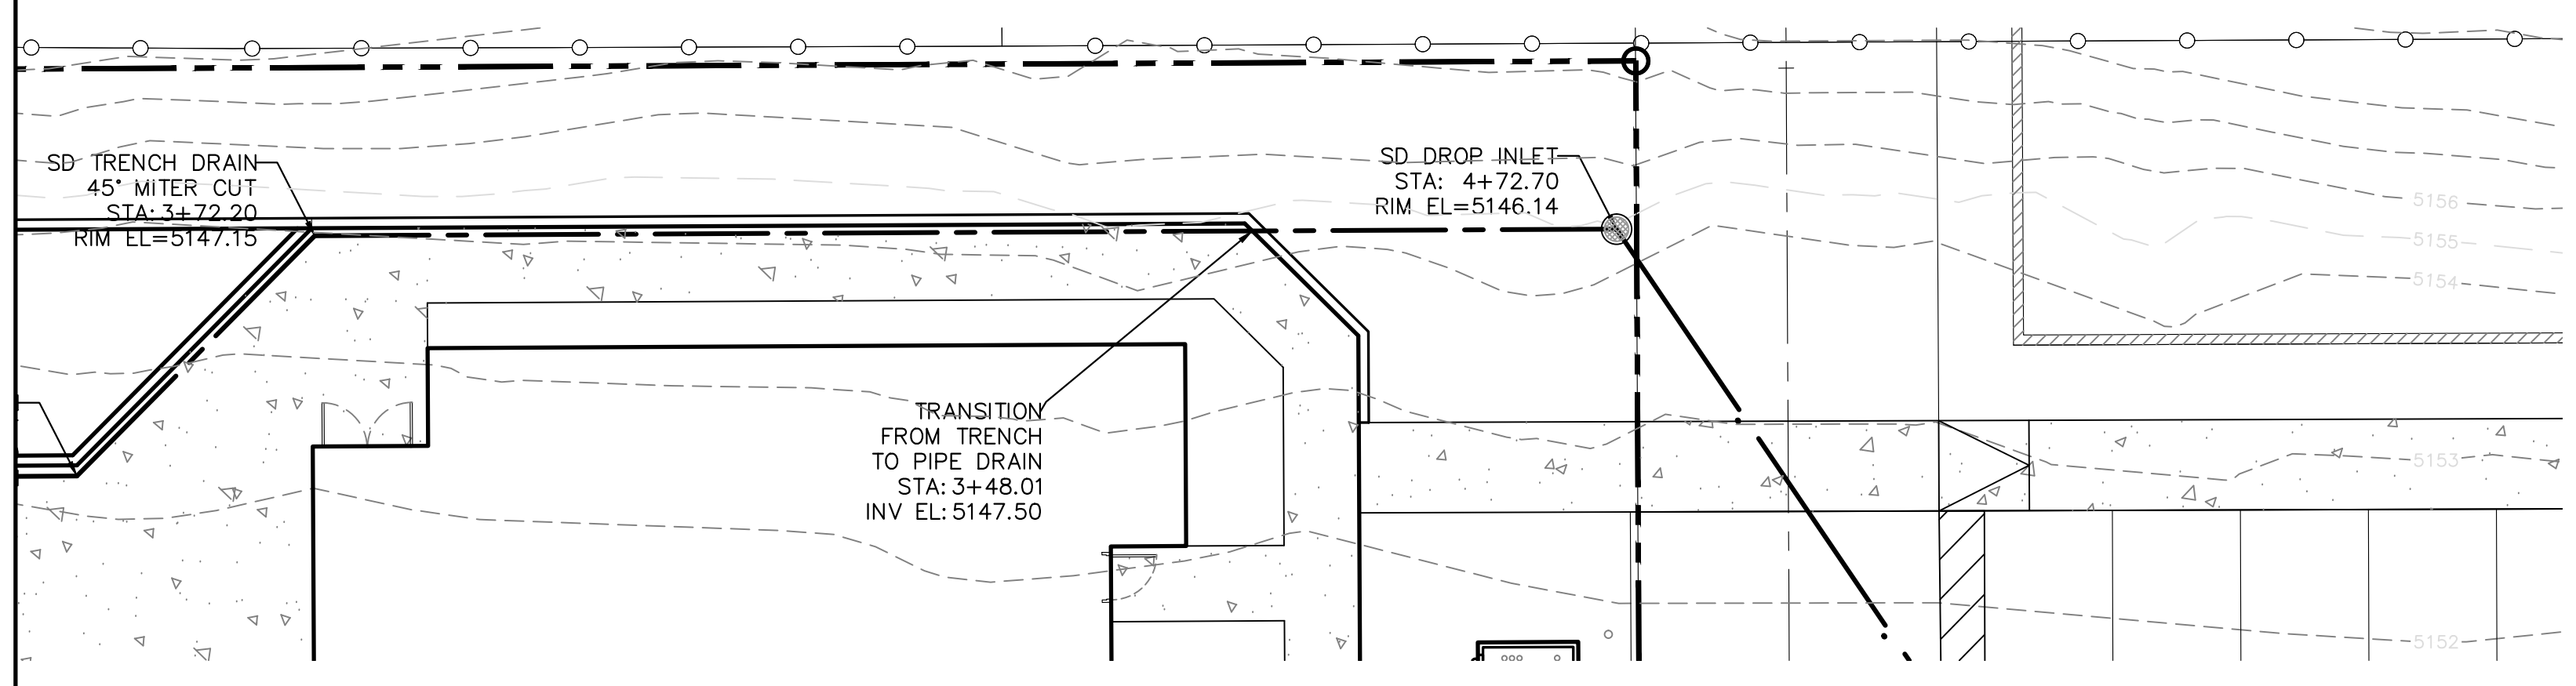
DETAIL A-A - ON-SITE STORM DRAIN SYSTEM
